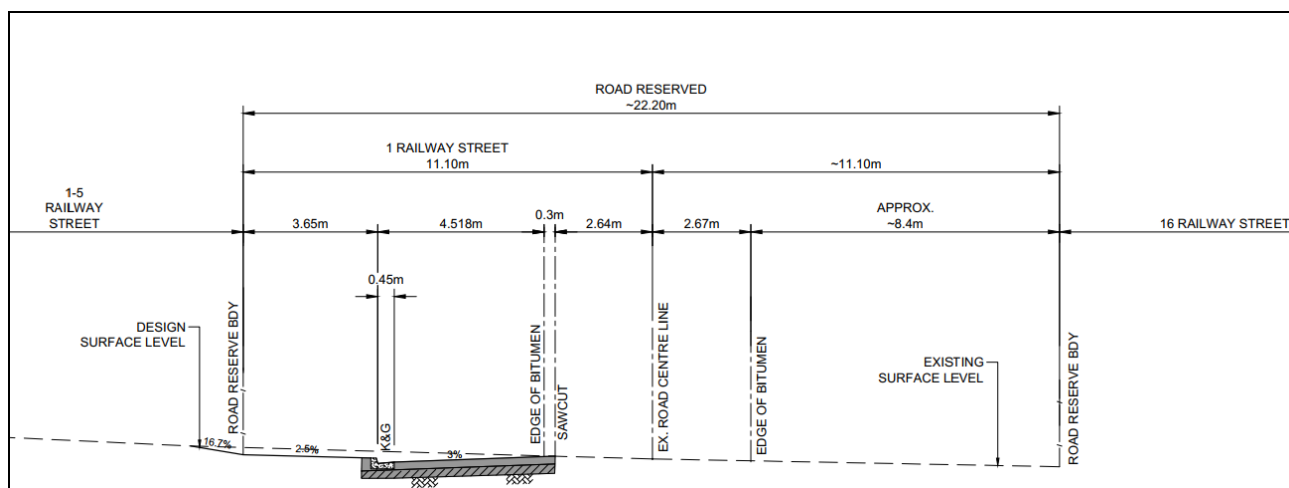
Railway Street formation fronting Lots 7 & 10
